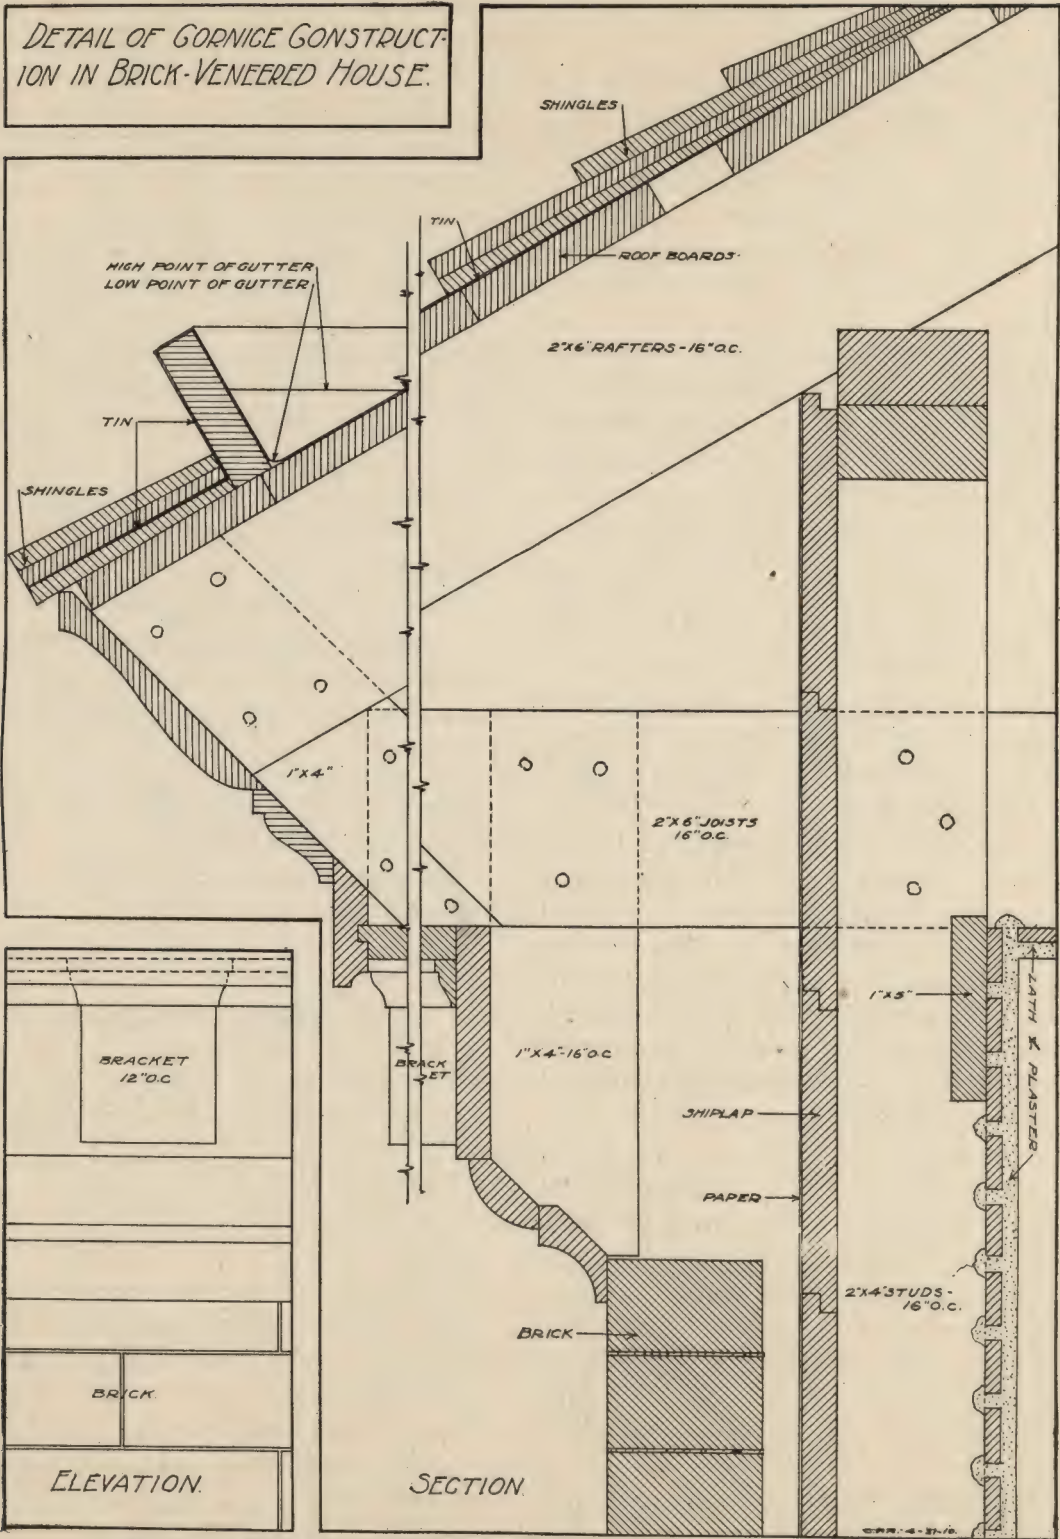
CORNICE CONSTRUCTION FOR A BRICK-VENEER HOUSE.
